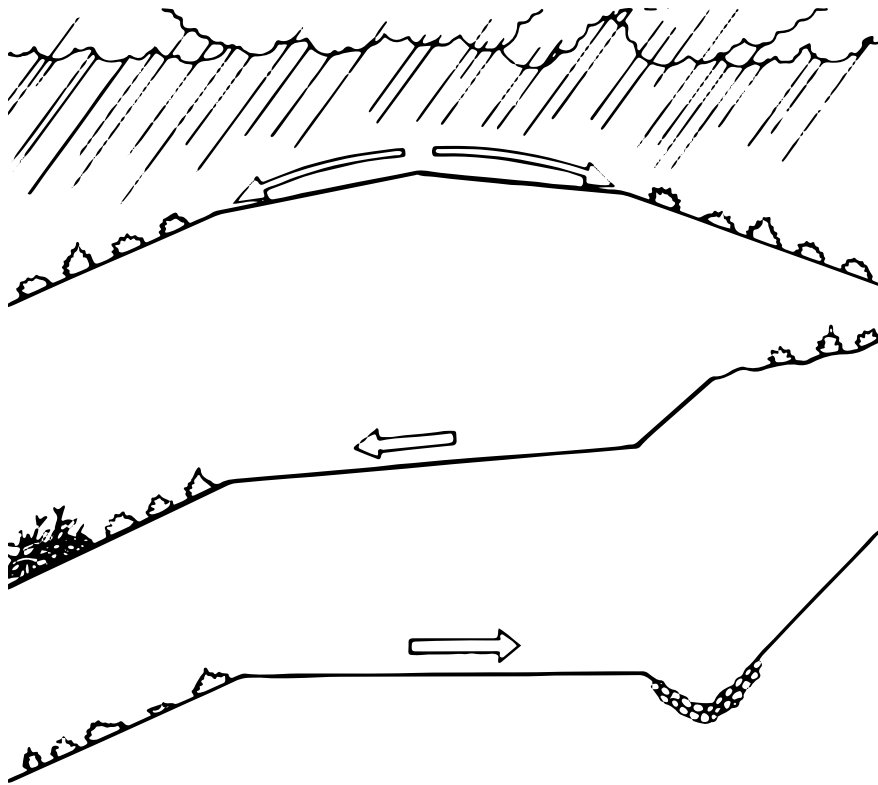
Intentionally design the way in which water will drain off a road surface. The crowned road (top) sheds water from a high point to both sides, the outsloped road (middle) drains across the road to the downslope, and the backsloped road (bottom) sheds to a drainage swale to be collected, infiltrated, and transported. This illustration is adapted from the “Low-Volume Roads Engineering Best Management Field Guide.”
